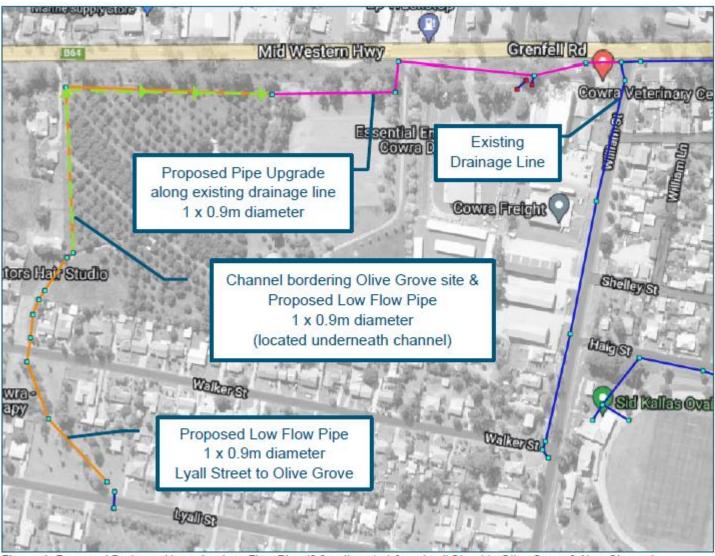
Proposed Drainage Upgrade - Low Flow Pipe (0.9m diameter) from Lyall Street to Olive Grove & New Channel
